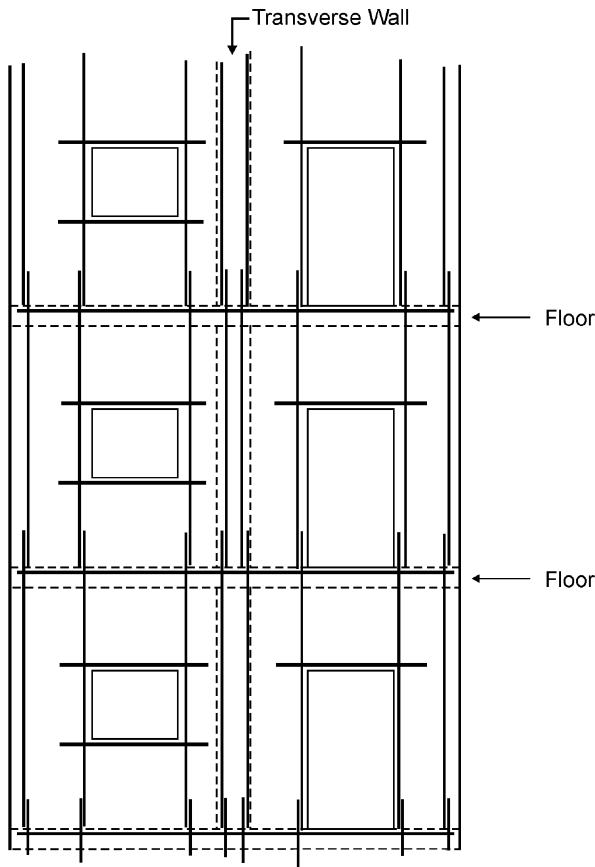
Horizontal and vertical steel ties in large lightly reinforced walls with openings
